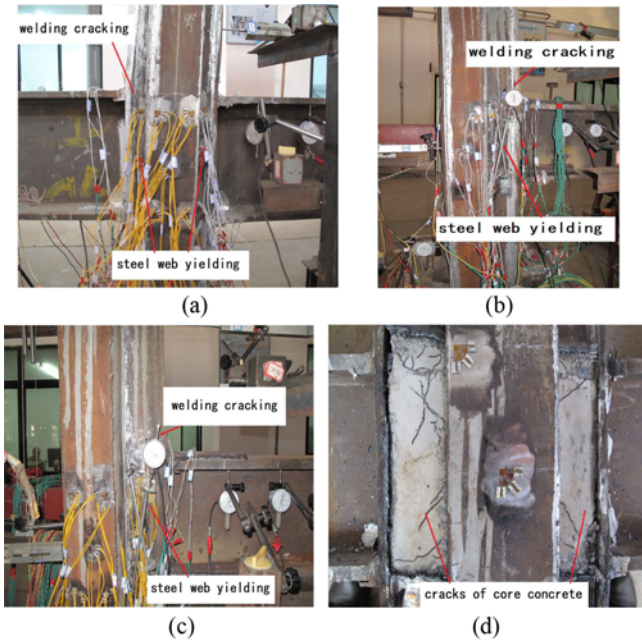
Failure of Joint: (a) Failure of Steel Tubular of Specimen S+2, (b) Failure of Steel Tubular of Specimen ST1, (c) Failure of Steel Tubular of Specimen SL1, (d) Failure of Confined Concrete of Specimen S+4
